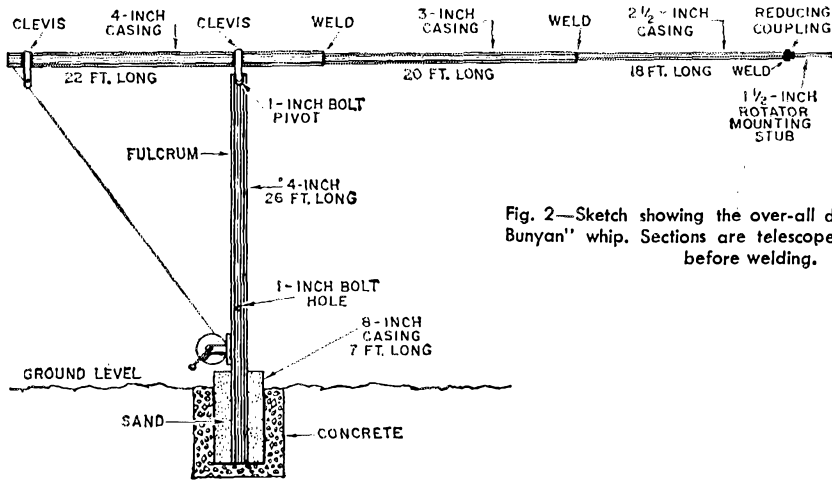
Sketch showing the over-all design of the "Paul Bunyan" whip. Sections are telescoped about 4 inches before welding.
